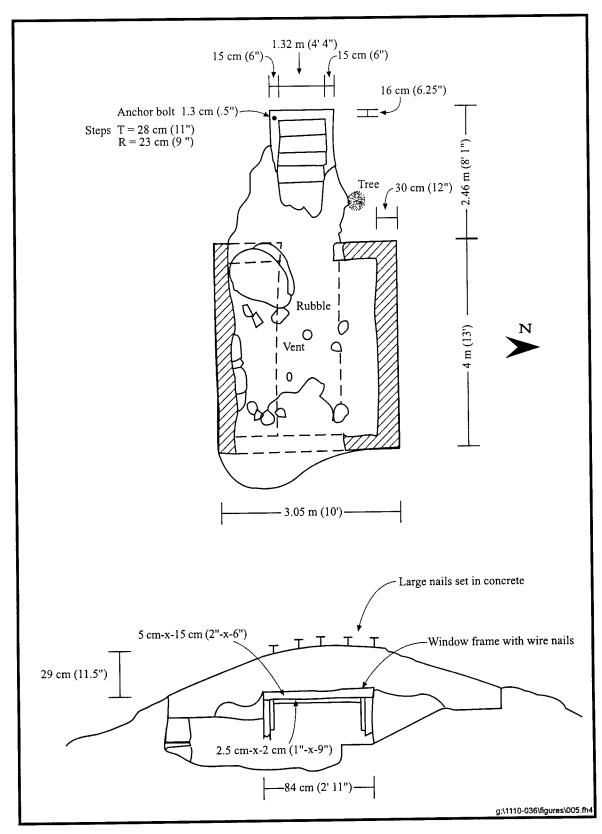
Plan view and east elevation of the storm shelter at site 34Cm-414.
